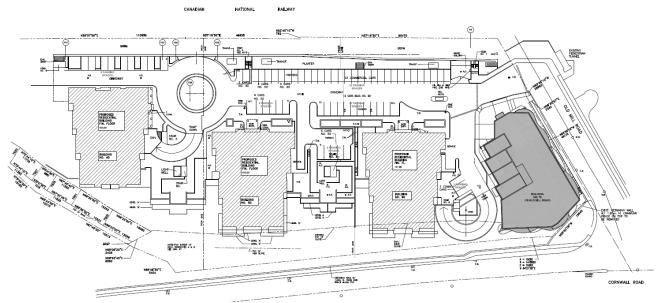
Context Plan identifying 70 Old Mill (grey building) to the east of 60, 50 and 40 Old Mill Road
